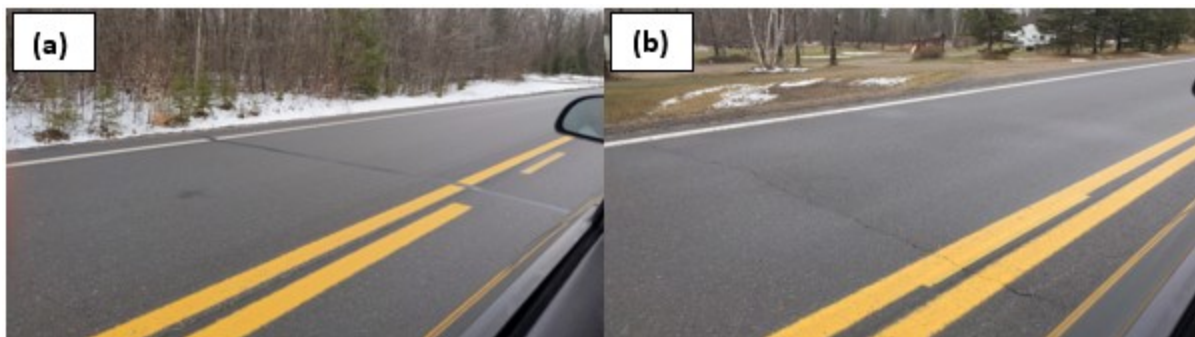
Typical Transvers Cracking on: (a) Beltrami CSAH 4 (Sealed), and (b) Hubbard CSAH 46
